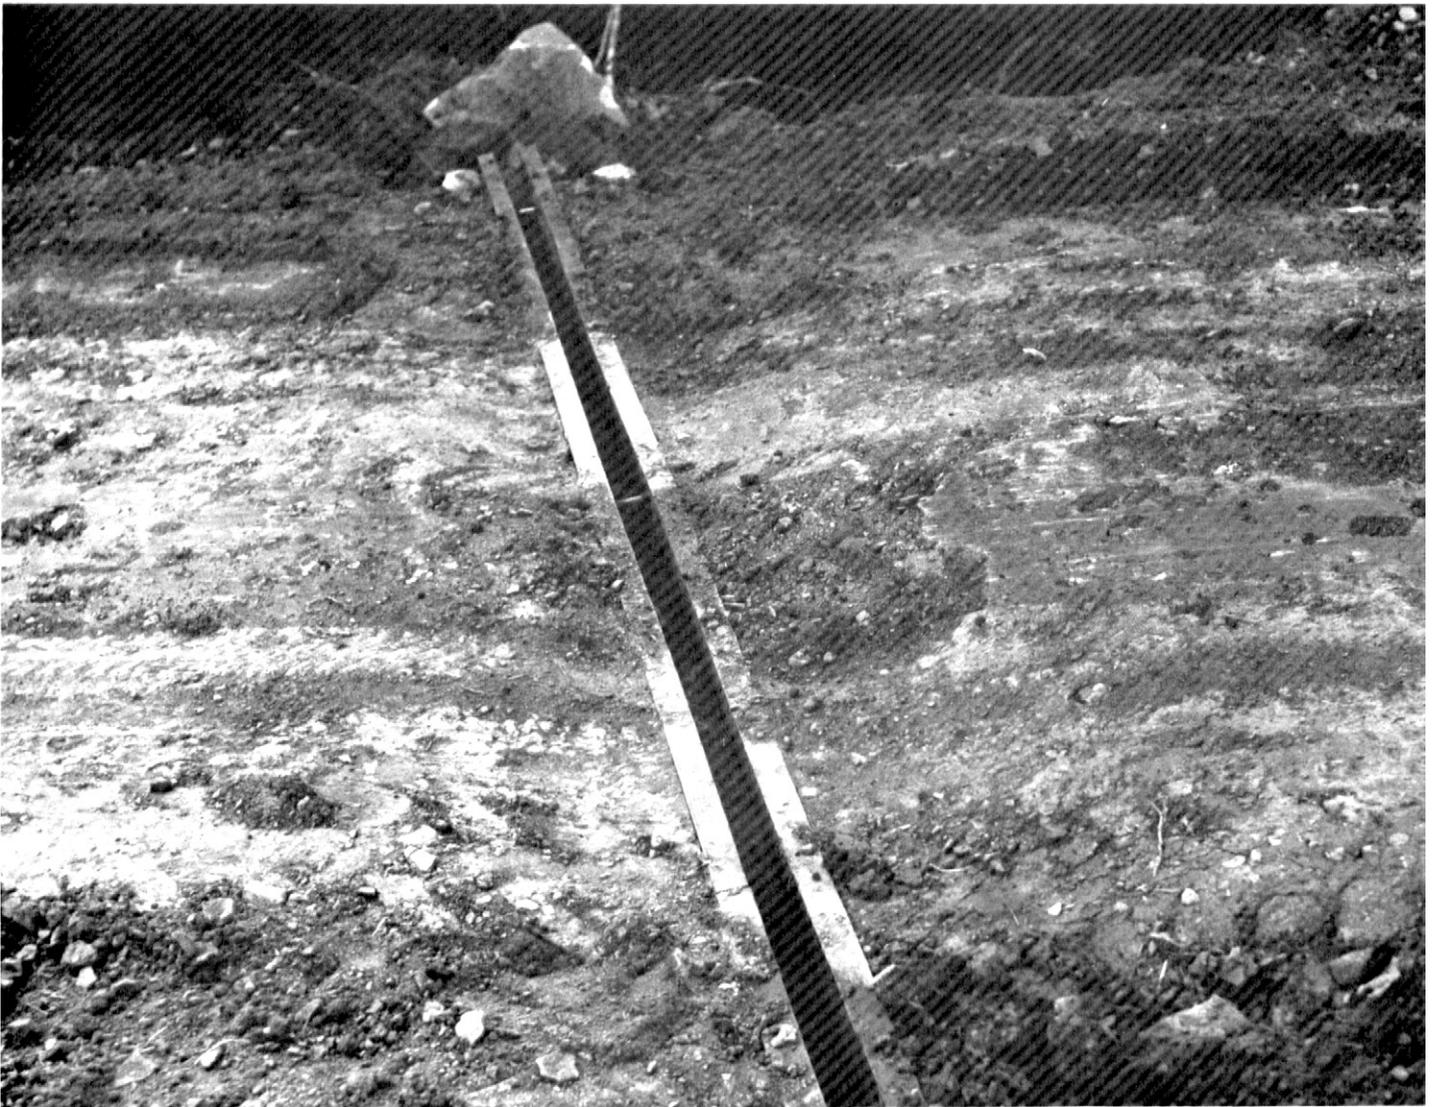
A box open-top culvert installed across a logging road in an area of the Shelocta-Brownsville association, steep. Culverts help to control erosion.
